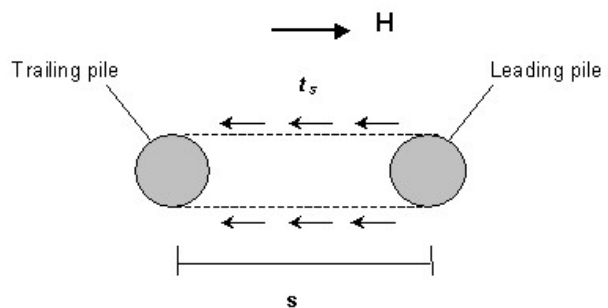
Plan view of block failure under lateral load (after Fleming et al, 1992)
